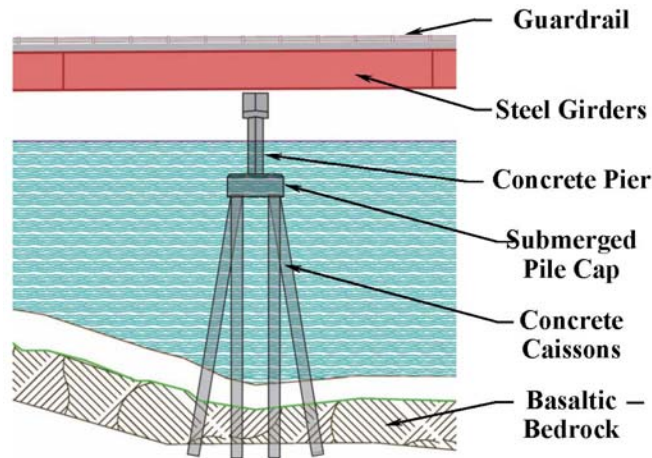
Upstream view of a typical river pier with innovative deep foundation system.
